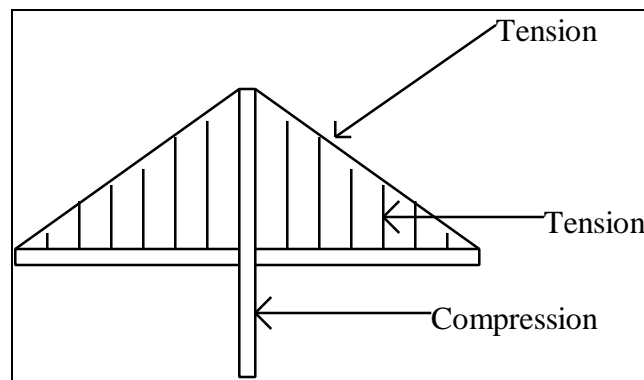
The Golden Gate Bridge has cables in tension as well as steel and concrete in compression to hold it up.
